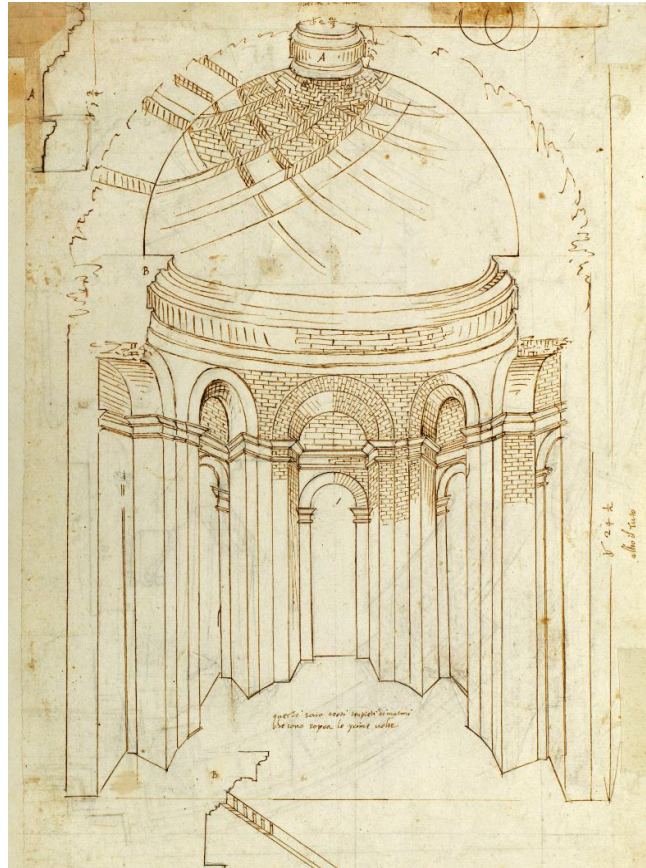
Drawing 1330 (n. 594469) GDSU. View of Simon Mago chapel, the cross-herringbone spiralling pattern is visible.
